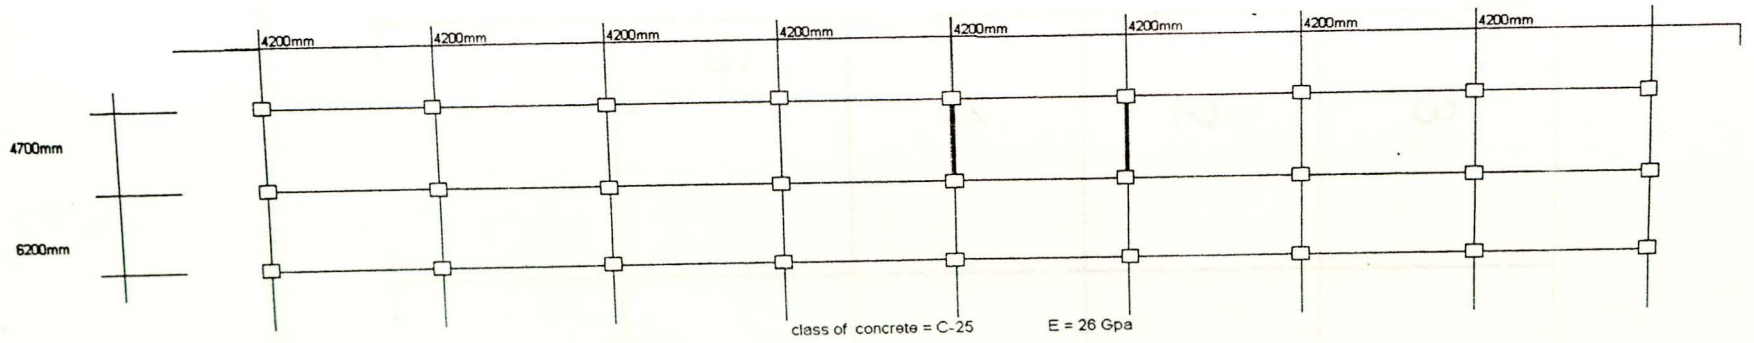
ETHIOPIAN GRAIN TRADE BUILDING FLOOR PLAN (BLOCK-A).
